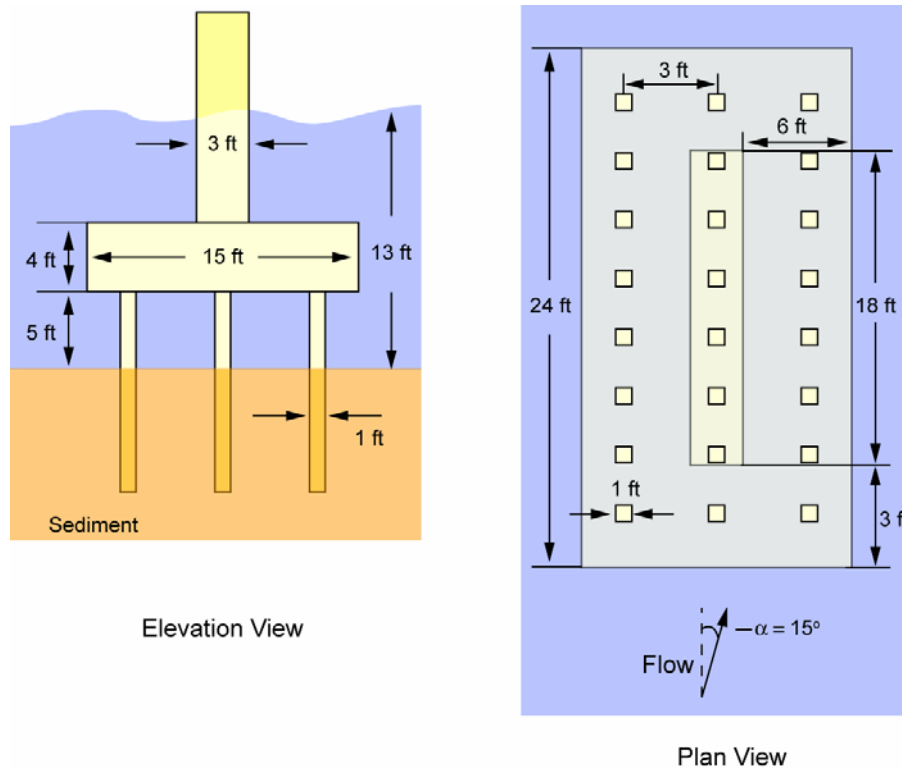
Elevation and plan view of the complex pier used in the Case 1 example scour calculation.
